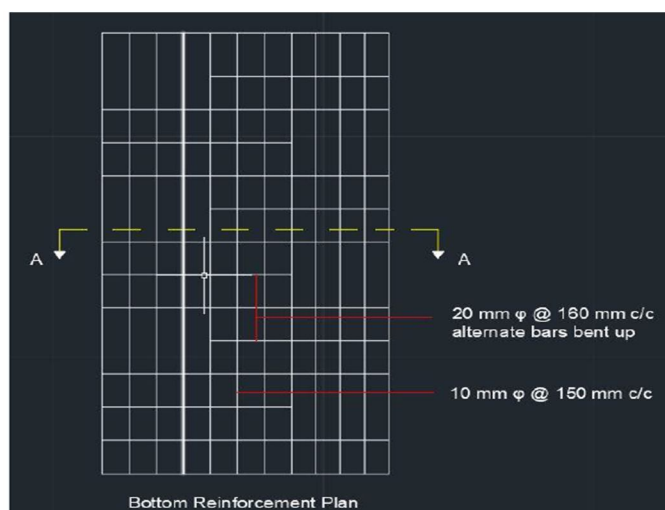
Shows the slab reinforcement details for the concrete deck slab. The 10 mm bars are used as stress distribution bars while the laterally provided bars are of 20 mm and these are the main reinforcements for the slab.
